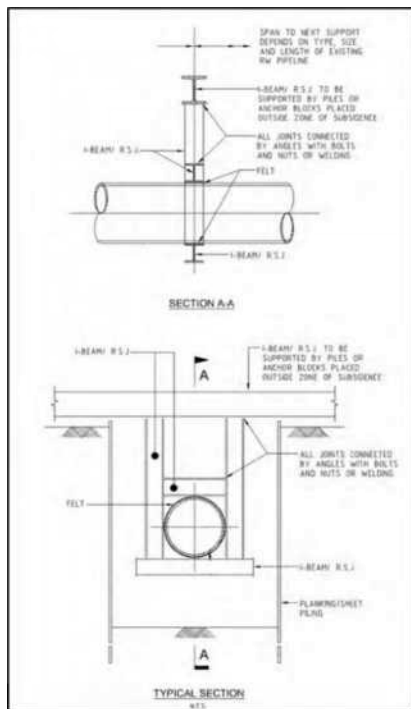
Existing Pipeline supported by Rolled Steel Joist (RSJ)
